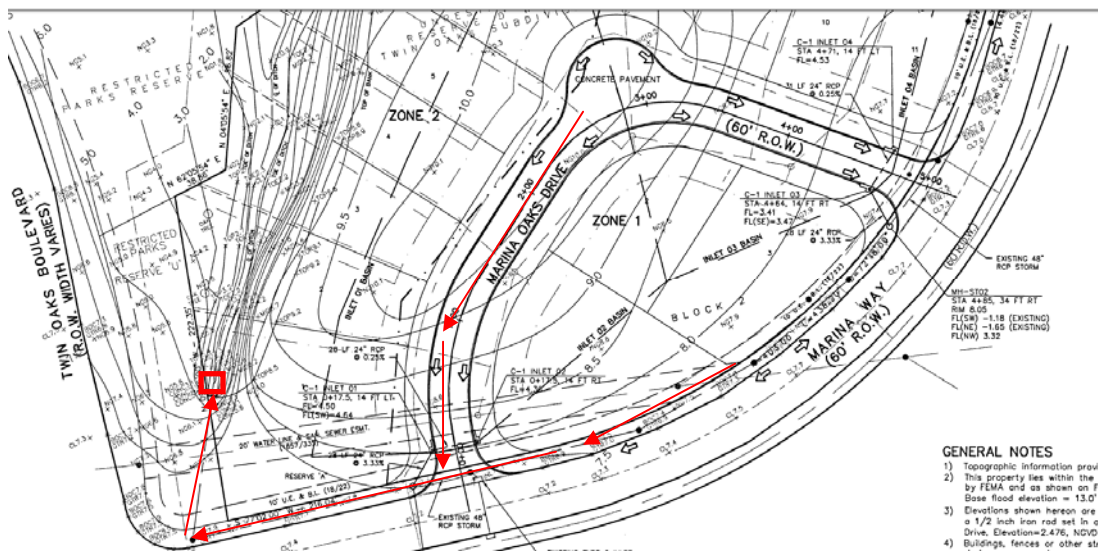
Path of stormwater to retention pond stormwater outfall.
